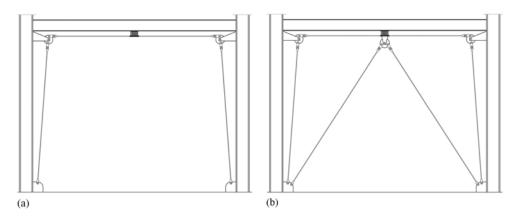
Adaptable Dual Control System with tension-only bracing-damper mechanism: (a) Portal bracing configuration, ADCS1; (b) Portal- and chevron bracing configuration, ADCS2
